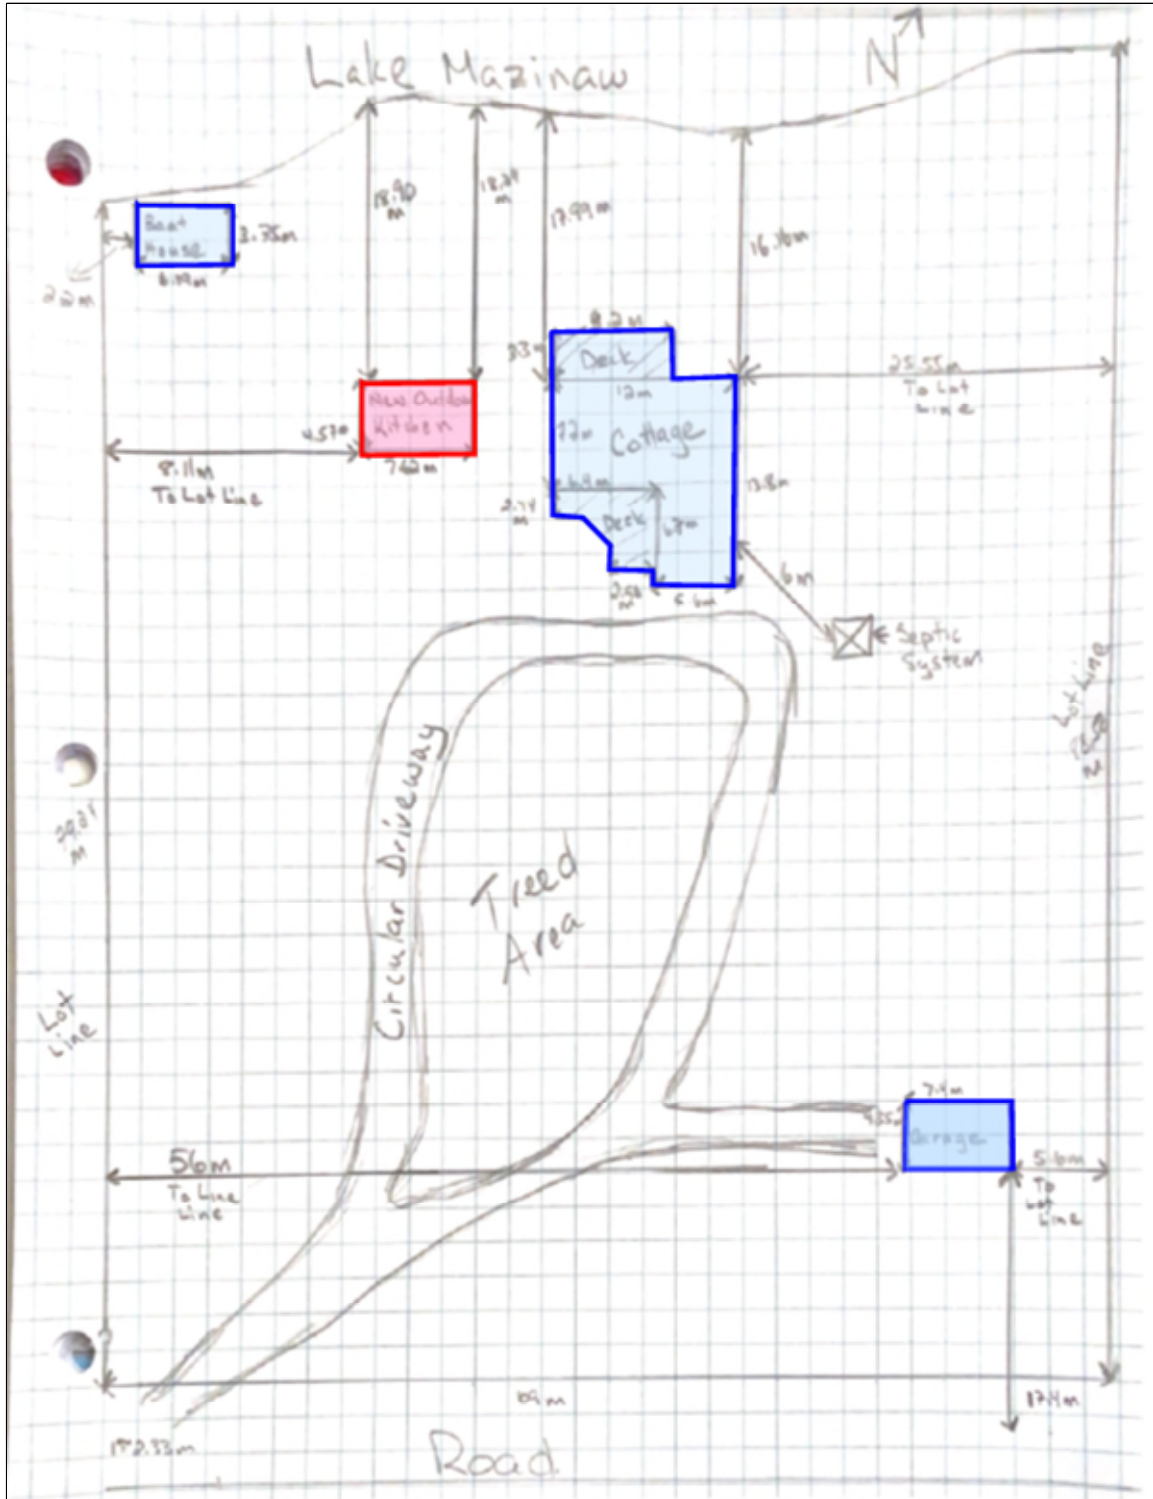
Plot plan submitted with the application showing the existing (blue outline) and proposed (red outline) structures.
